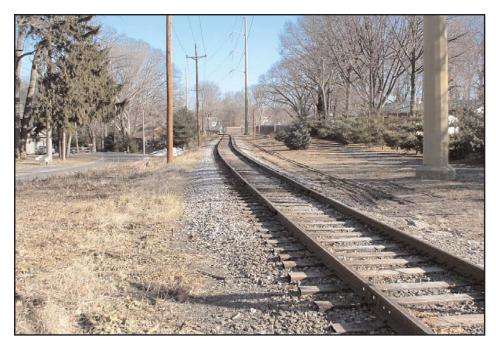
Camden County Railroad. View looking north from Anderson Avenue (September 2003).
